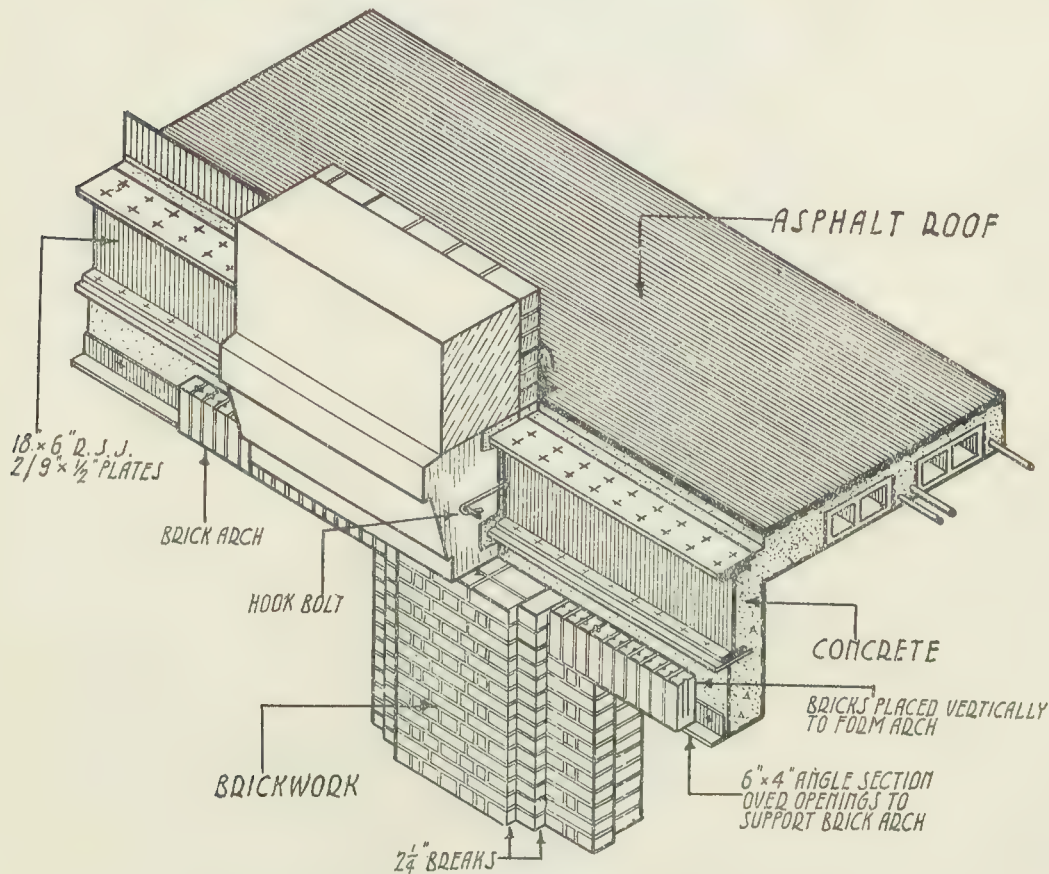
BRICK AND RECONSTRUCTED STONE-FACED WALL
